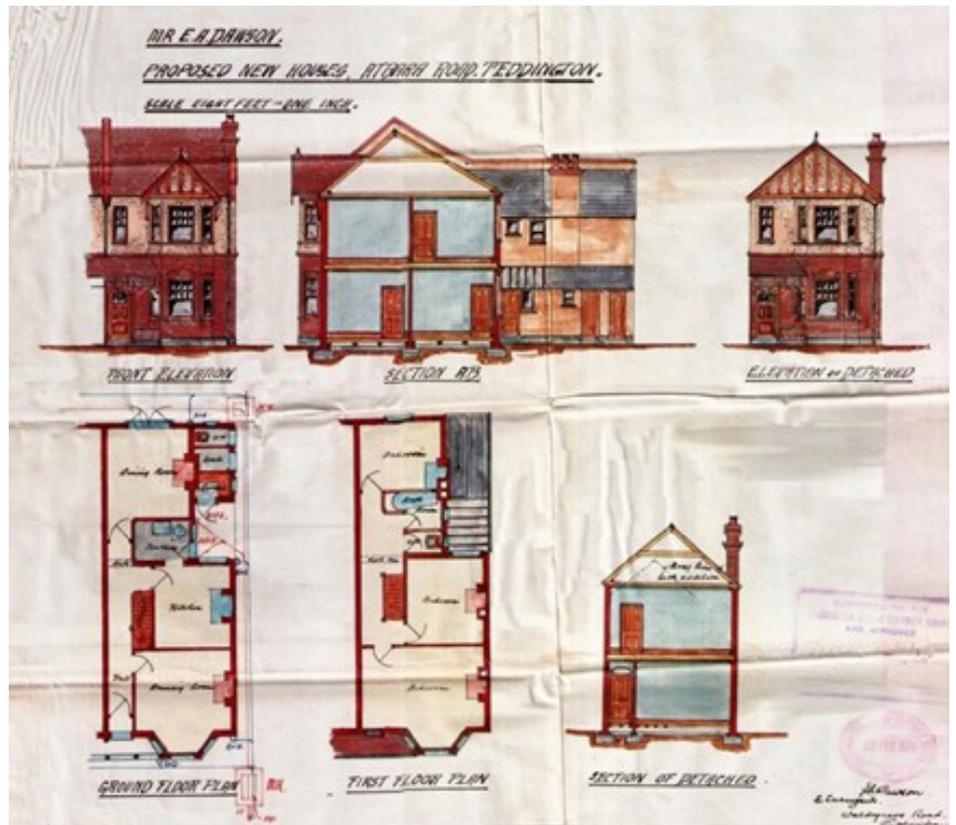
Drawing by builder-architect E.A. Dawson, based in Teddington, for terraced and detached houses in Atbara Road, 1904. (Richmond Local Studies Archive, PLA/00175).
